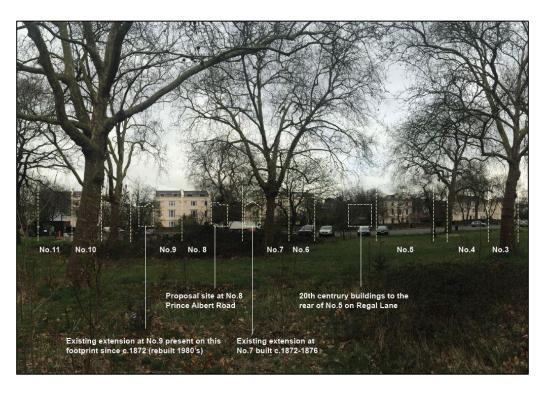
(above): Longer range view of existing Prince Albert Road streetscene, with proposed massing outline for extension at No. 8 Prince Albert Road.
